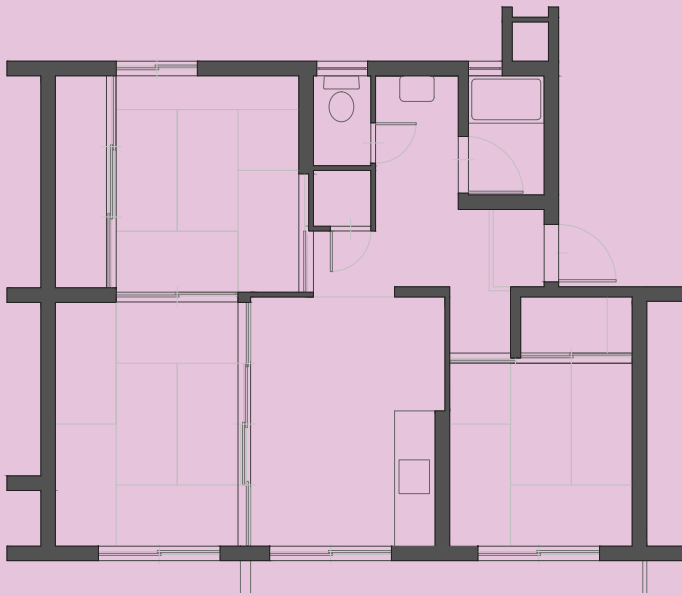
Plan of Kodan 3DK House (63-5N-3DK) Typology. Source: Authors
